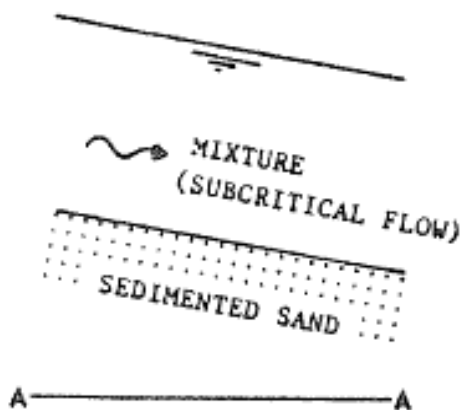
Longitudinal section during falling water. (Source: Mastbergen et al, 1988)
